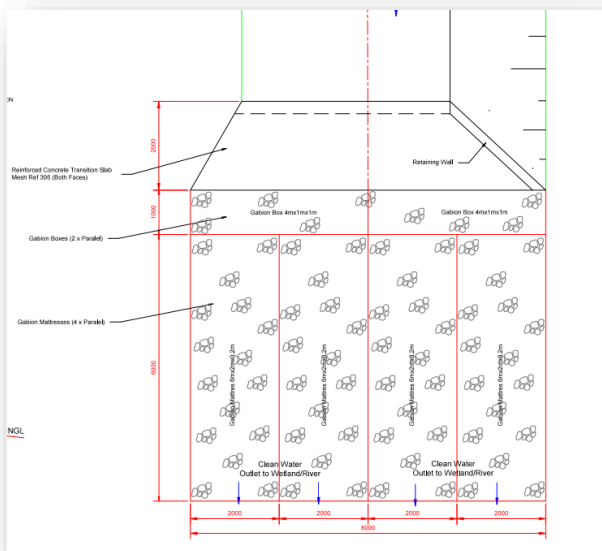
Typical Erosion Protection at Clean Water Diversion Berm Outlets
